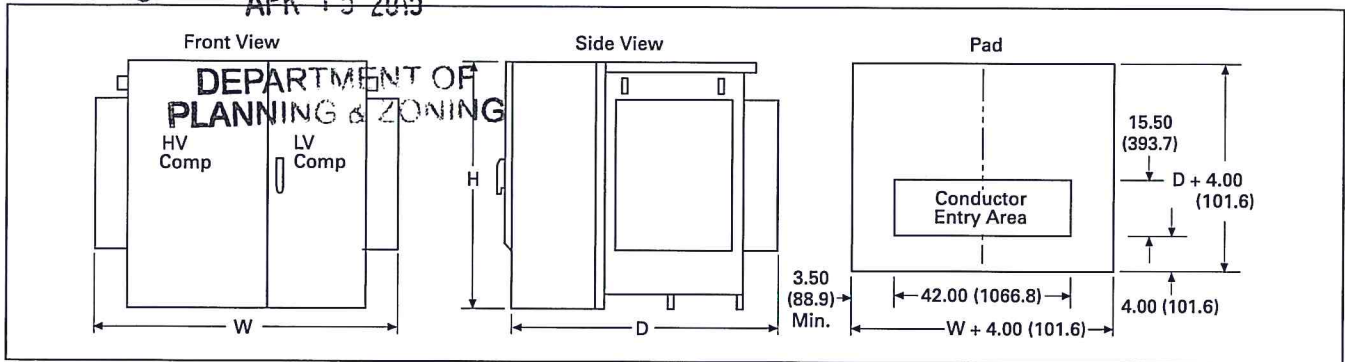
Pad-Mounted Transformer (75–2500 kVA)—Dimensions in Inches (mm)
